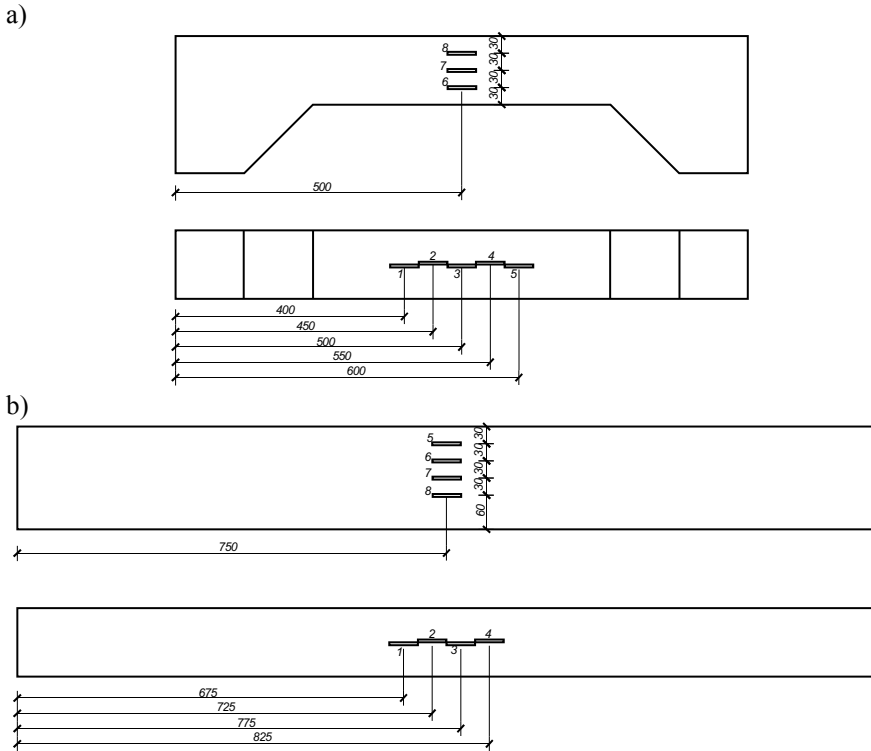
Reinforcement scheme and geometric dimensions of experimental samples of reinforced concrete columns (a) and beams (b)
